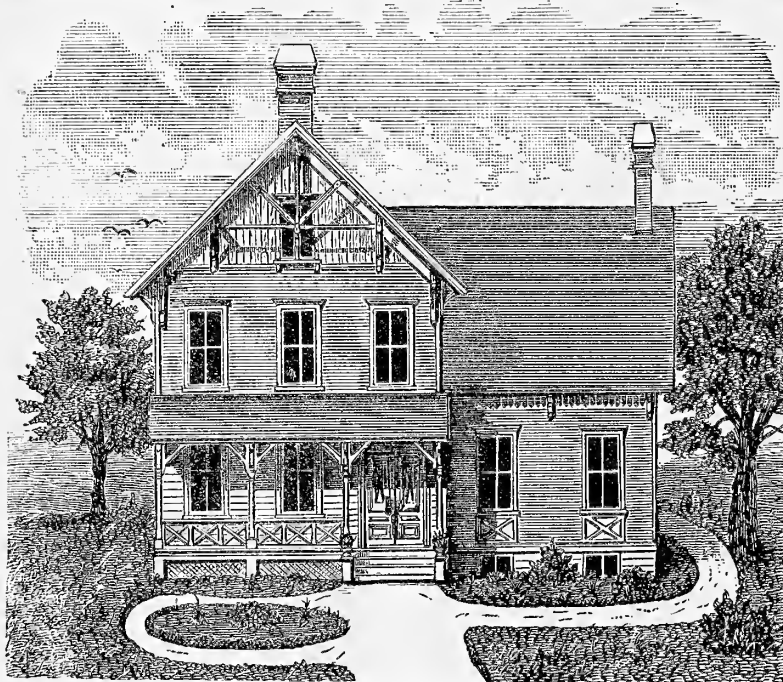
FRONT ELEVATION OF THE HOUSE.
